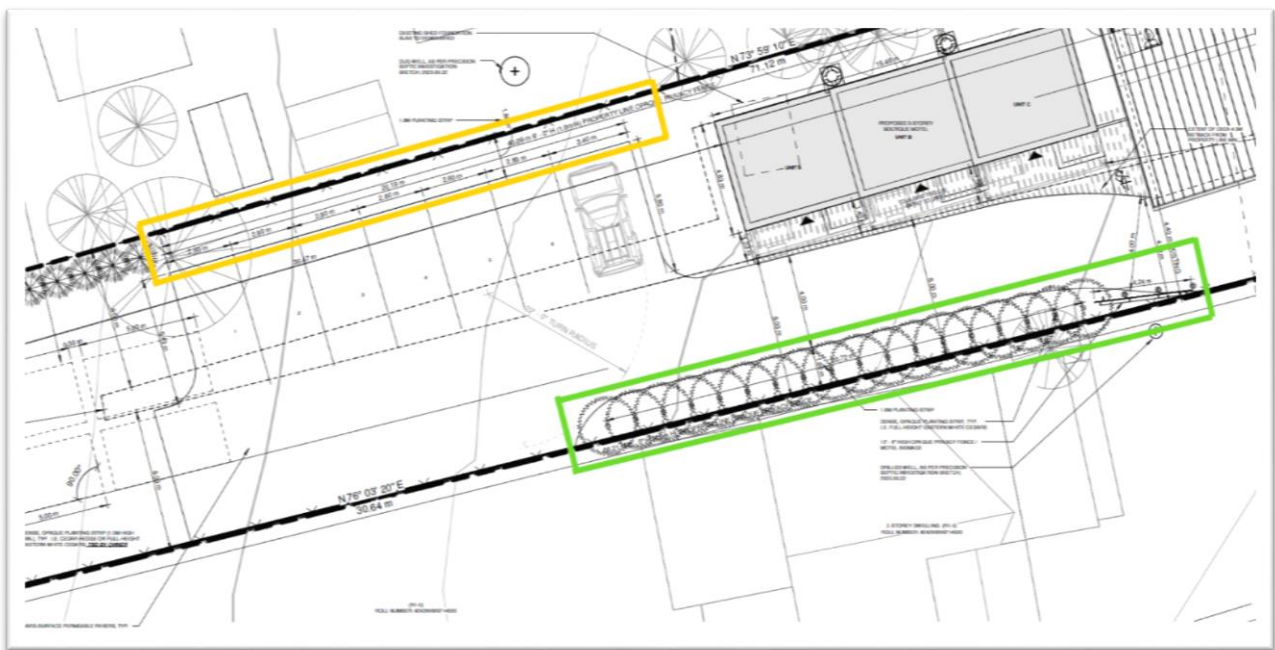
Proposed portions 1.8 m wide planting strip locations. The green outline indicates the proposed planting strip along the south lot line, and the yellow outline indicates the proposed planting strip along the north lot line.
